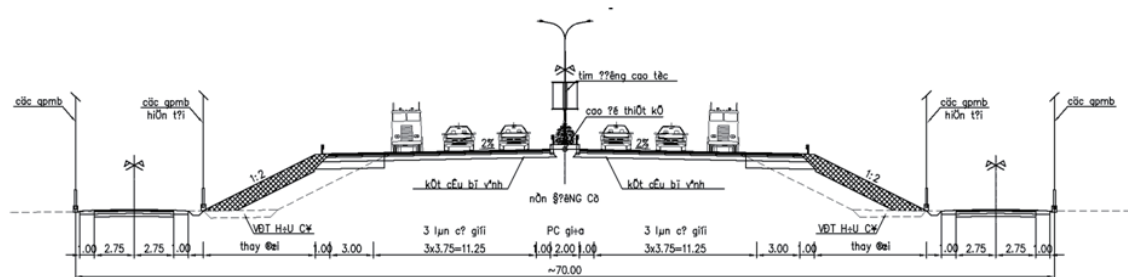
Typical Cross Section of Embankment Section (ROW=70 m)
